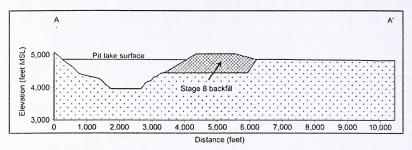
Stage 8 Cross Section A to A' through Pipeline/South Pipeline Open Pit
